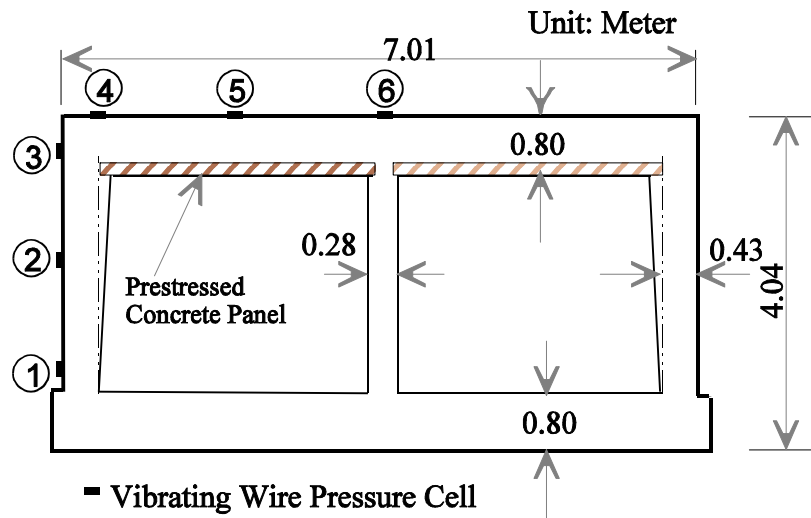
Illustration of Culvert Dimensions and Pressure Cell Location
